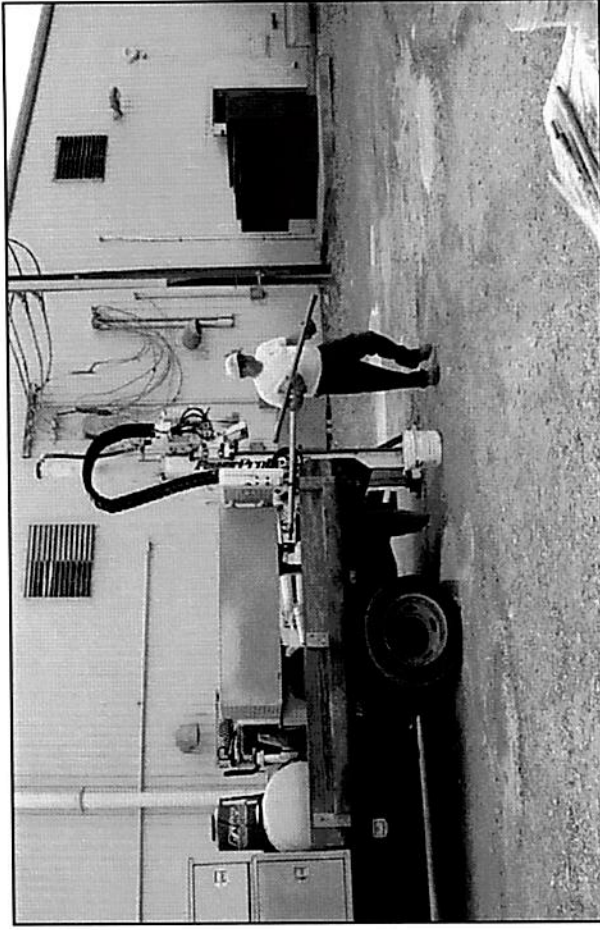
Looking southeast as GP-1 is advanced. 04/22/05
